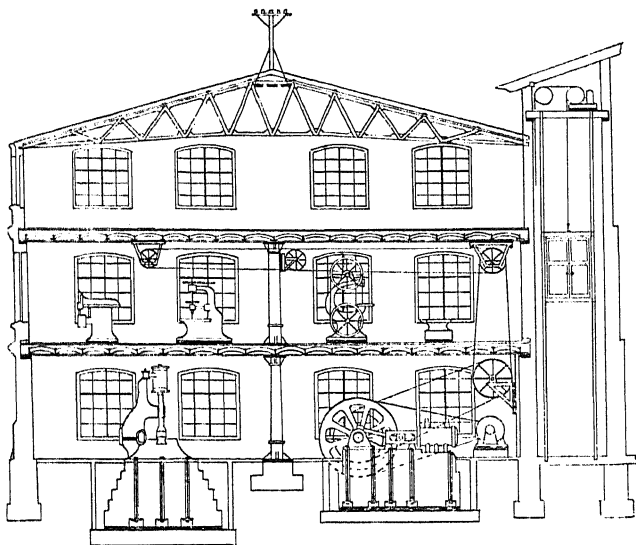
Section of Factory Equipped throughout with Felt Vibration Insulation.
